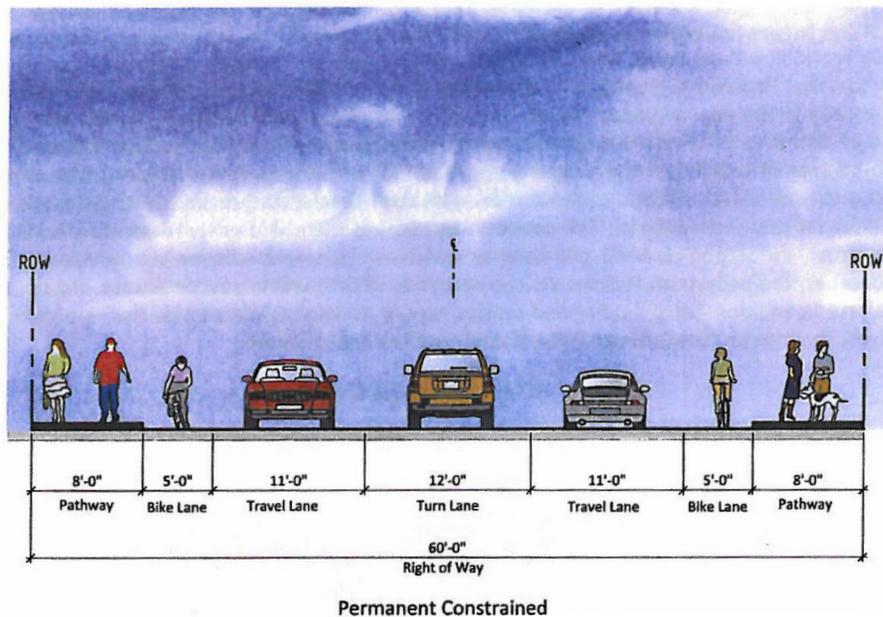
Recommended Refined Street Section, Downtown Gualala
